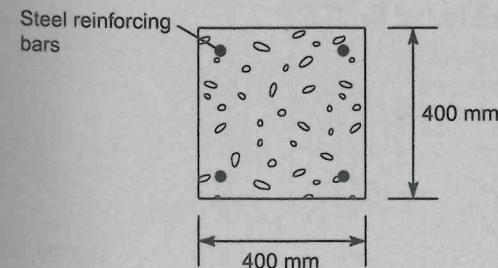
Reinforced concrete column of Ex. 7.9.
